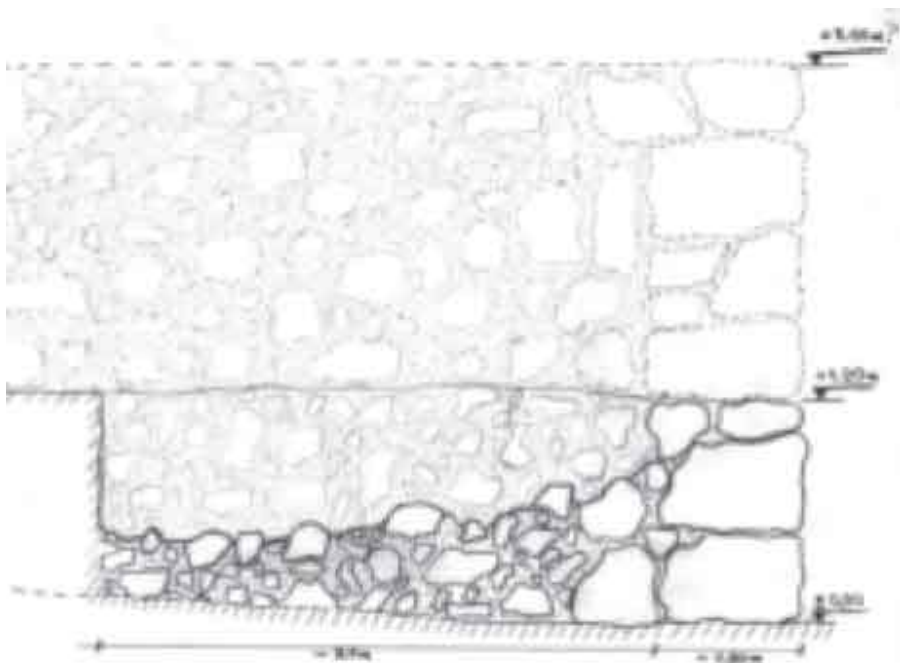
Section of wall shown in Fig. 15 with suggested completion of the elevation (University of Athens, Archive Palaioimanina).
